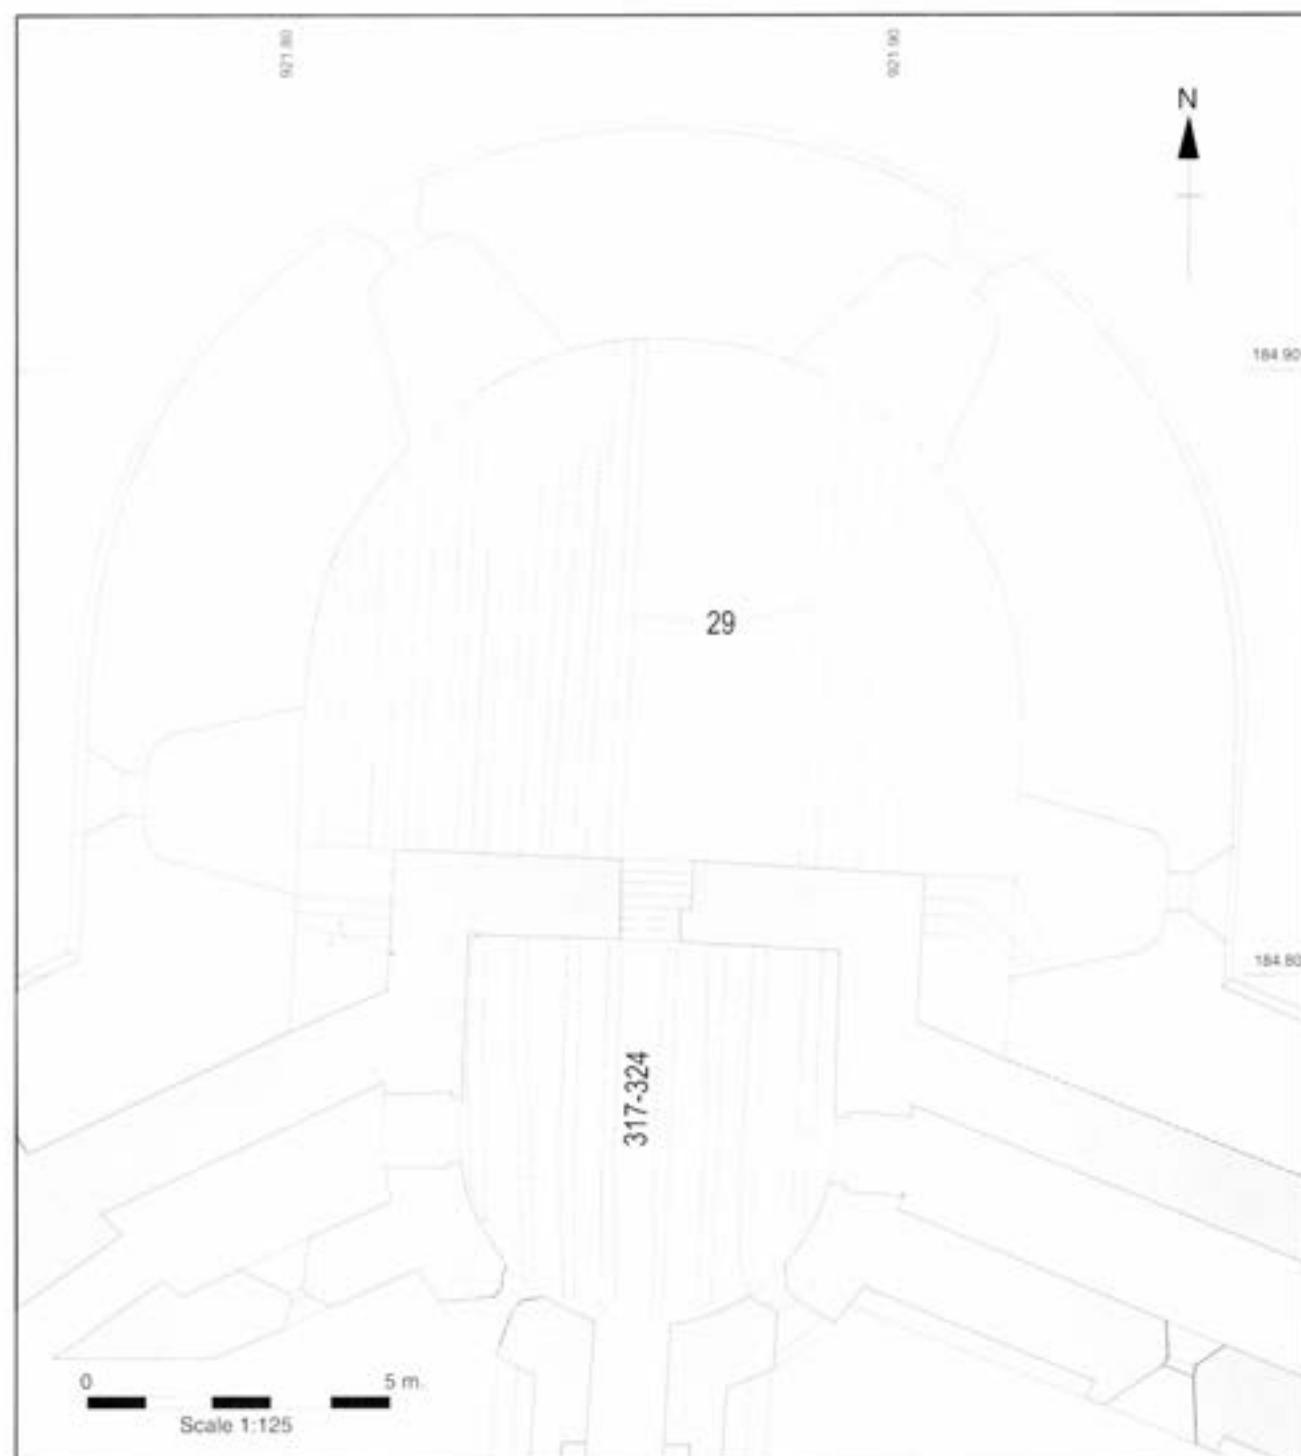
N Bastion and N Stirrup Tower: plan of floors
